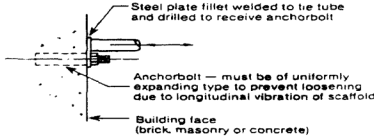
Anchor bolt tie. Vertical or horizontal section through wall where no openings or members are available for tying to.
